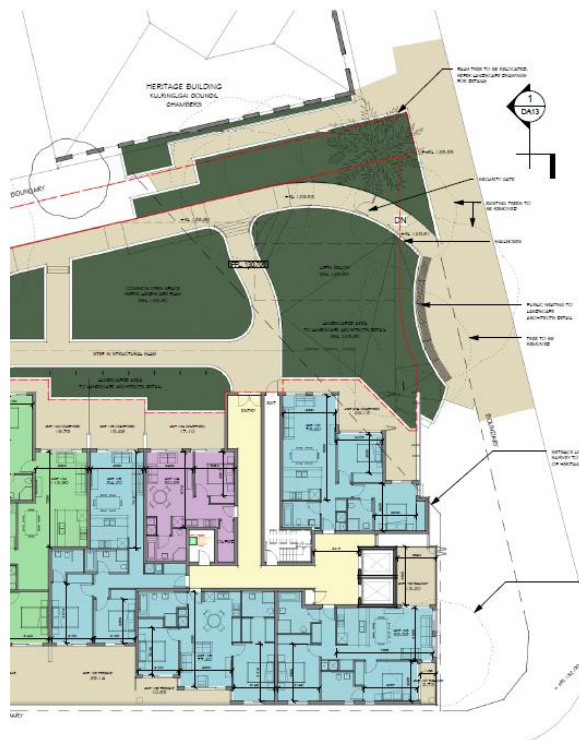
Second Pre-DA Scheme Floor Plan – First Floor
